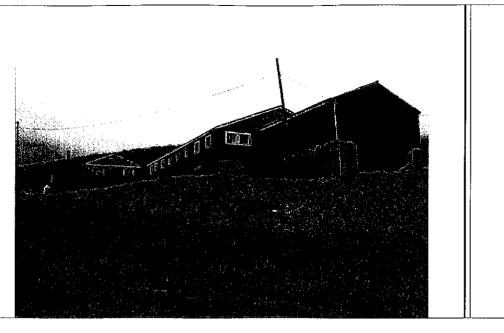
04/27/05 – Pig Barn (Building #7): Exterior of building note silo foundation
